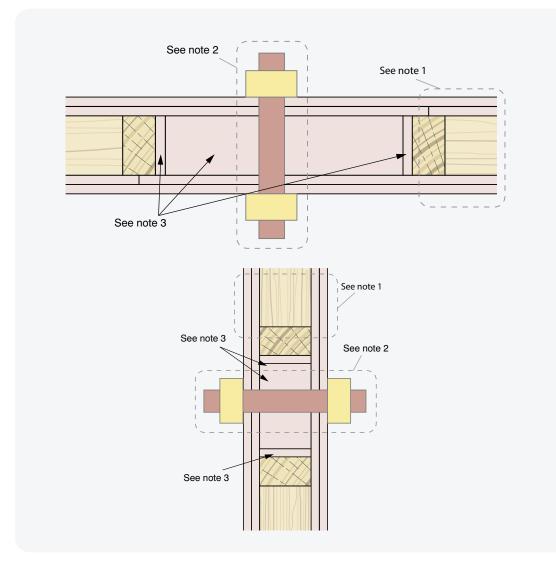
Plastic pipe penetration through fire-protected timber-framed walls with internal linings.
